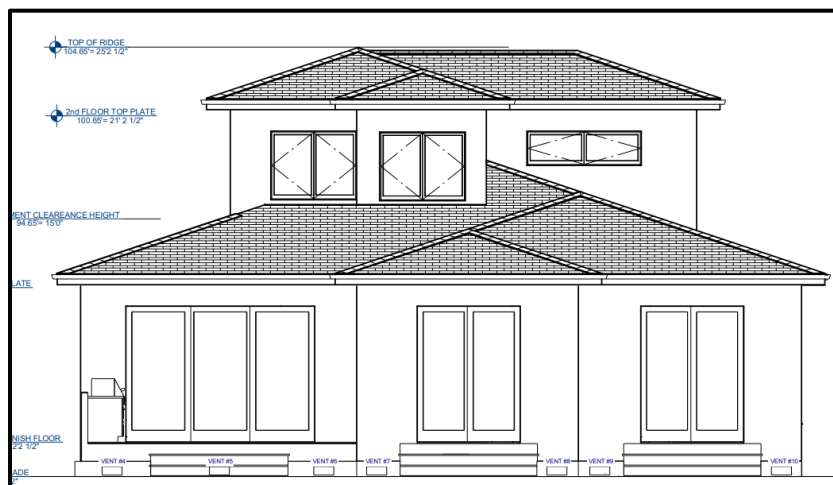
Existing Front Façade of 445 Roswell Drive
